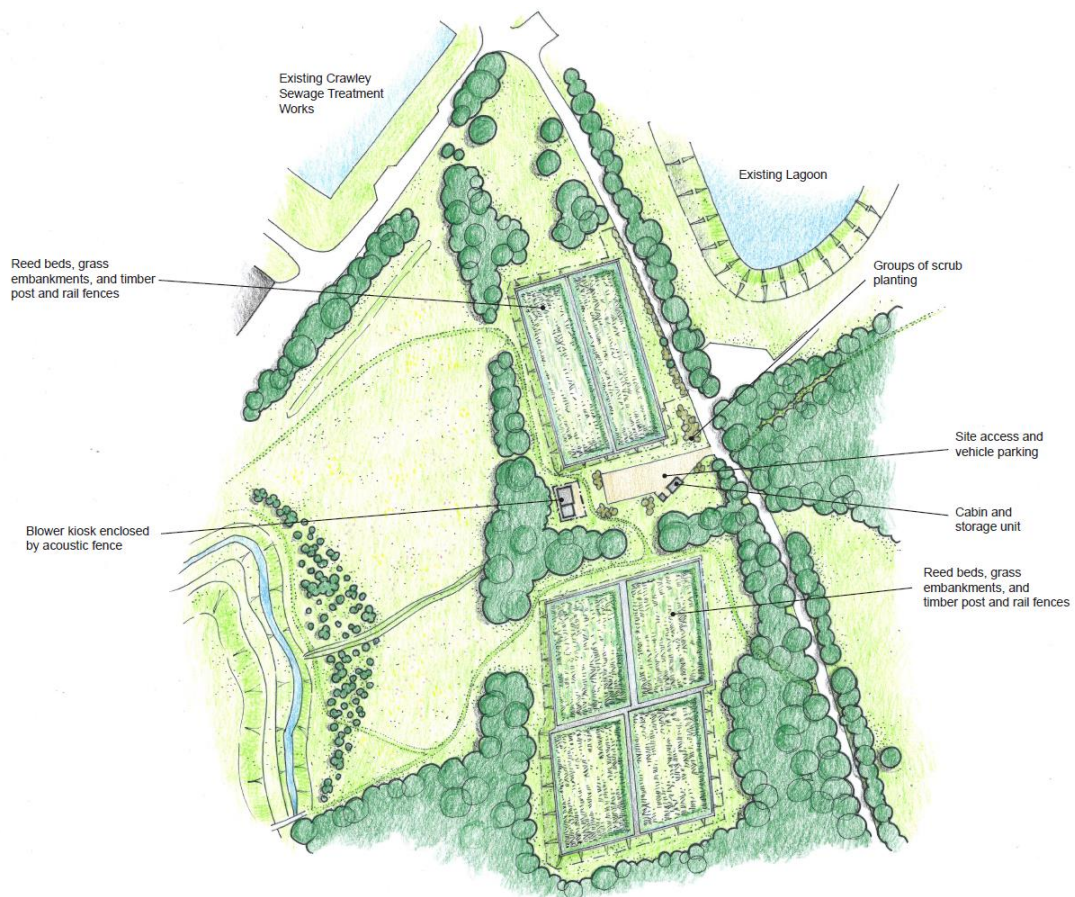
Project Change 3 – sketch of the proposed constructed wetland (reed bed) system
